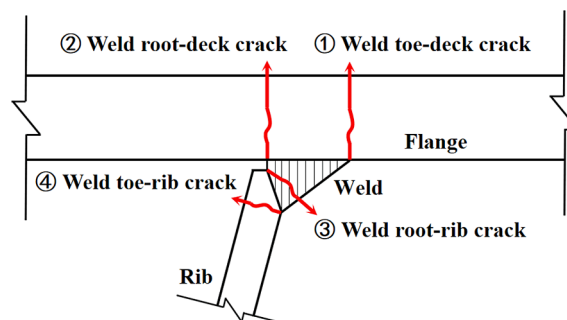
Schematic diagram of fatigue crack at the position of rib to deck joint.
